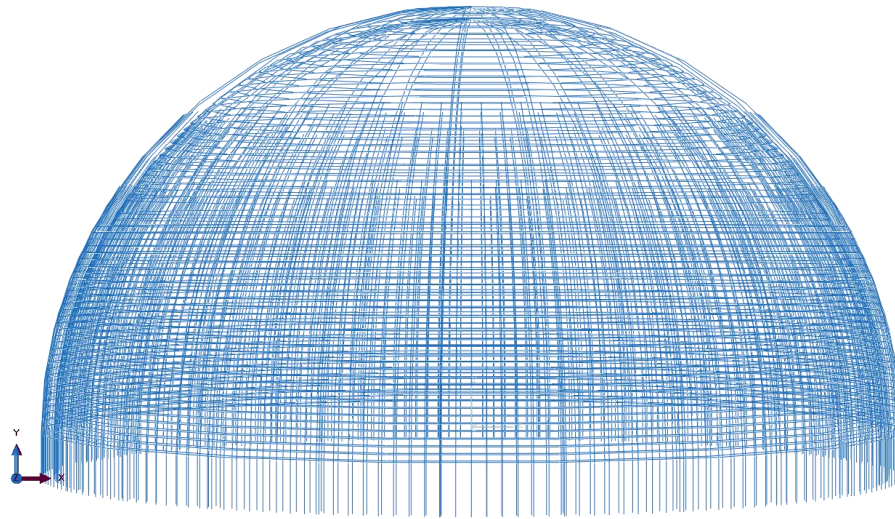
Dome Reinforcement (Elevation) [14]
